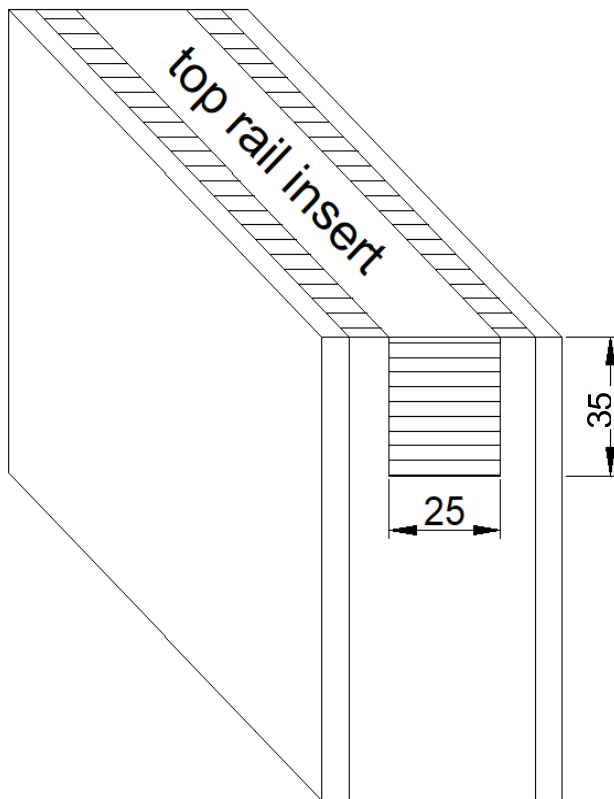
Cross section through head of door leaf showing position of lamin board head rail insert
